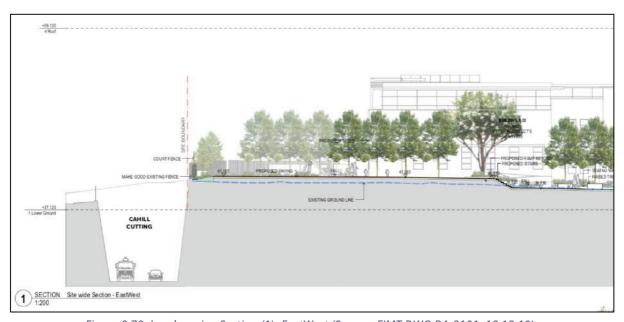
Landscaping Section (1)- EastWest (Source: FJMT DWG DA-8101, 18.12.19)
